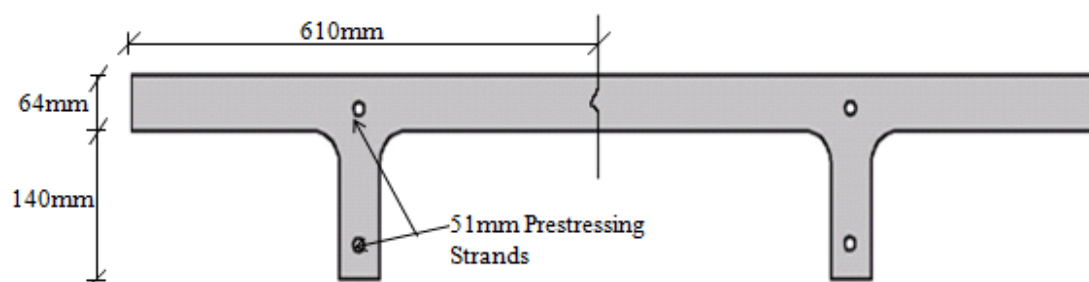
UHPFRC waffle slab cross section. Adapted from Graybeal (2009)
